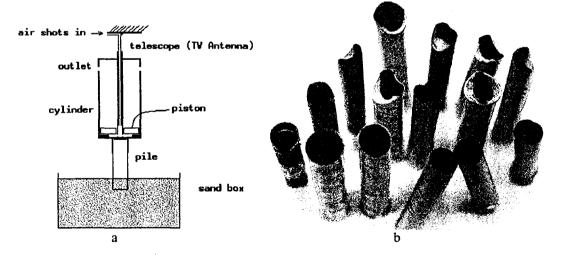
a) Diagram pile driving unit. b) Example of tested piles.
